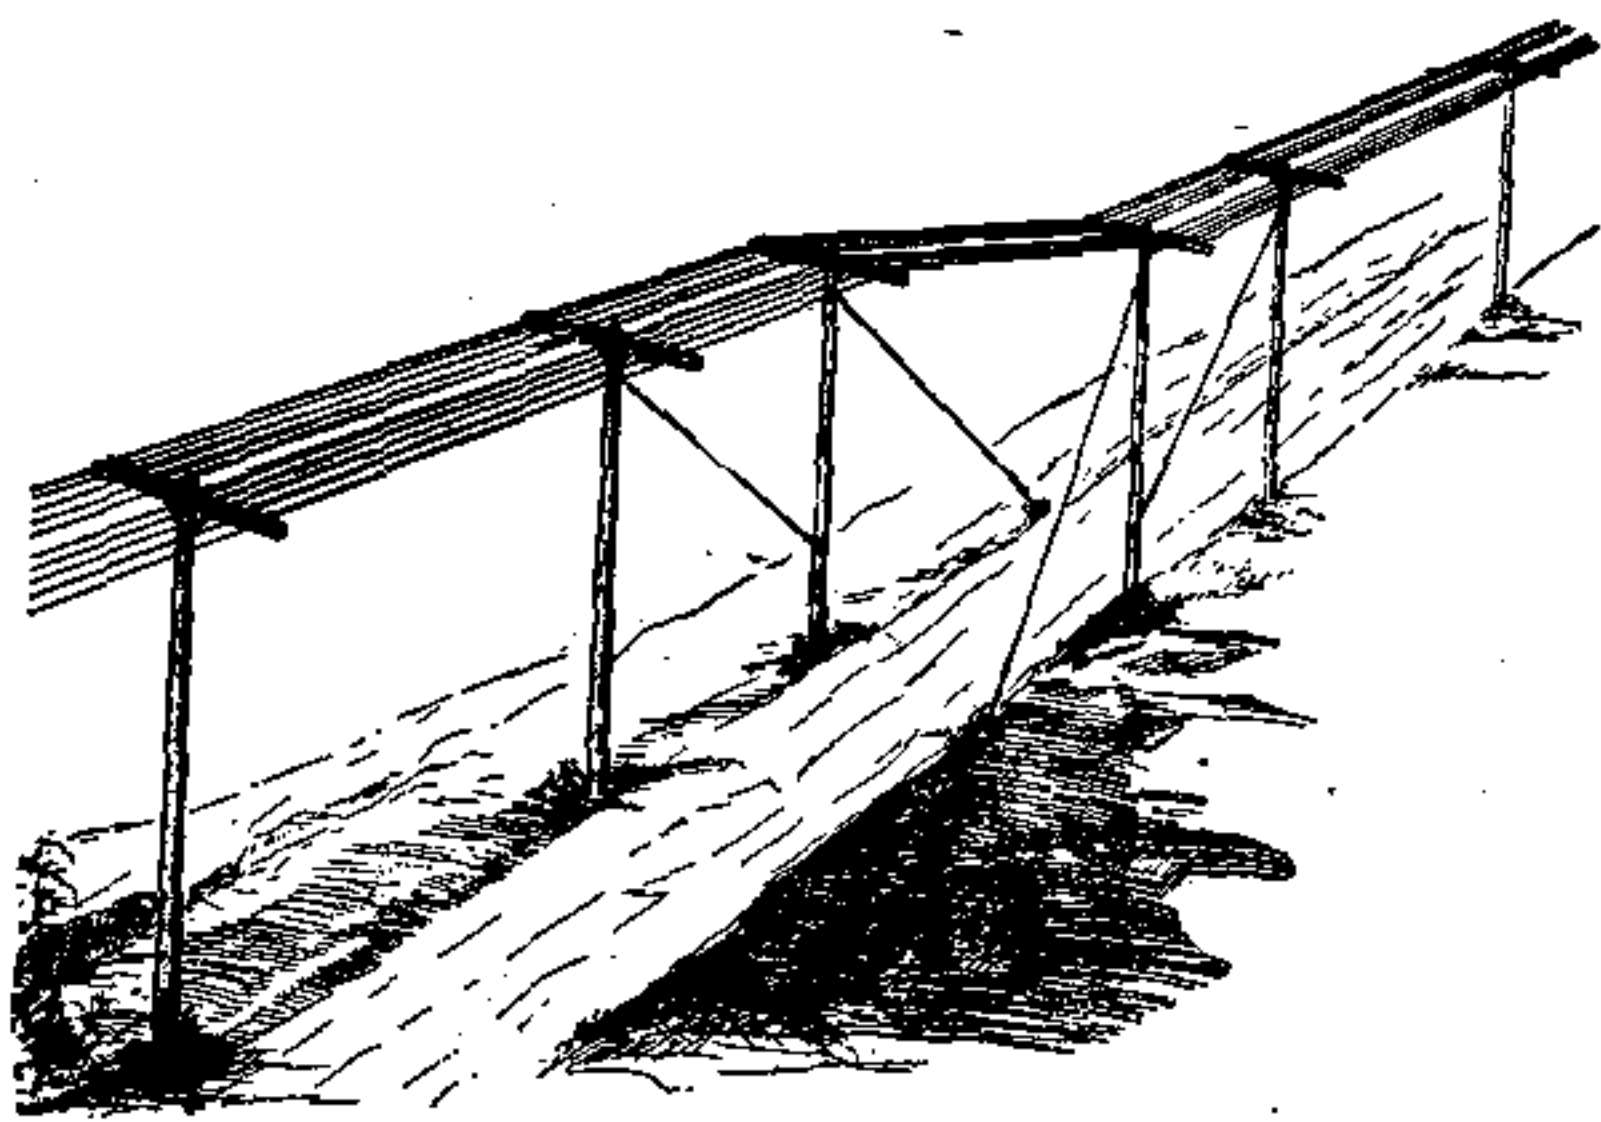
HIGHWAY CROSSING WITH SIDE GUYS.
